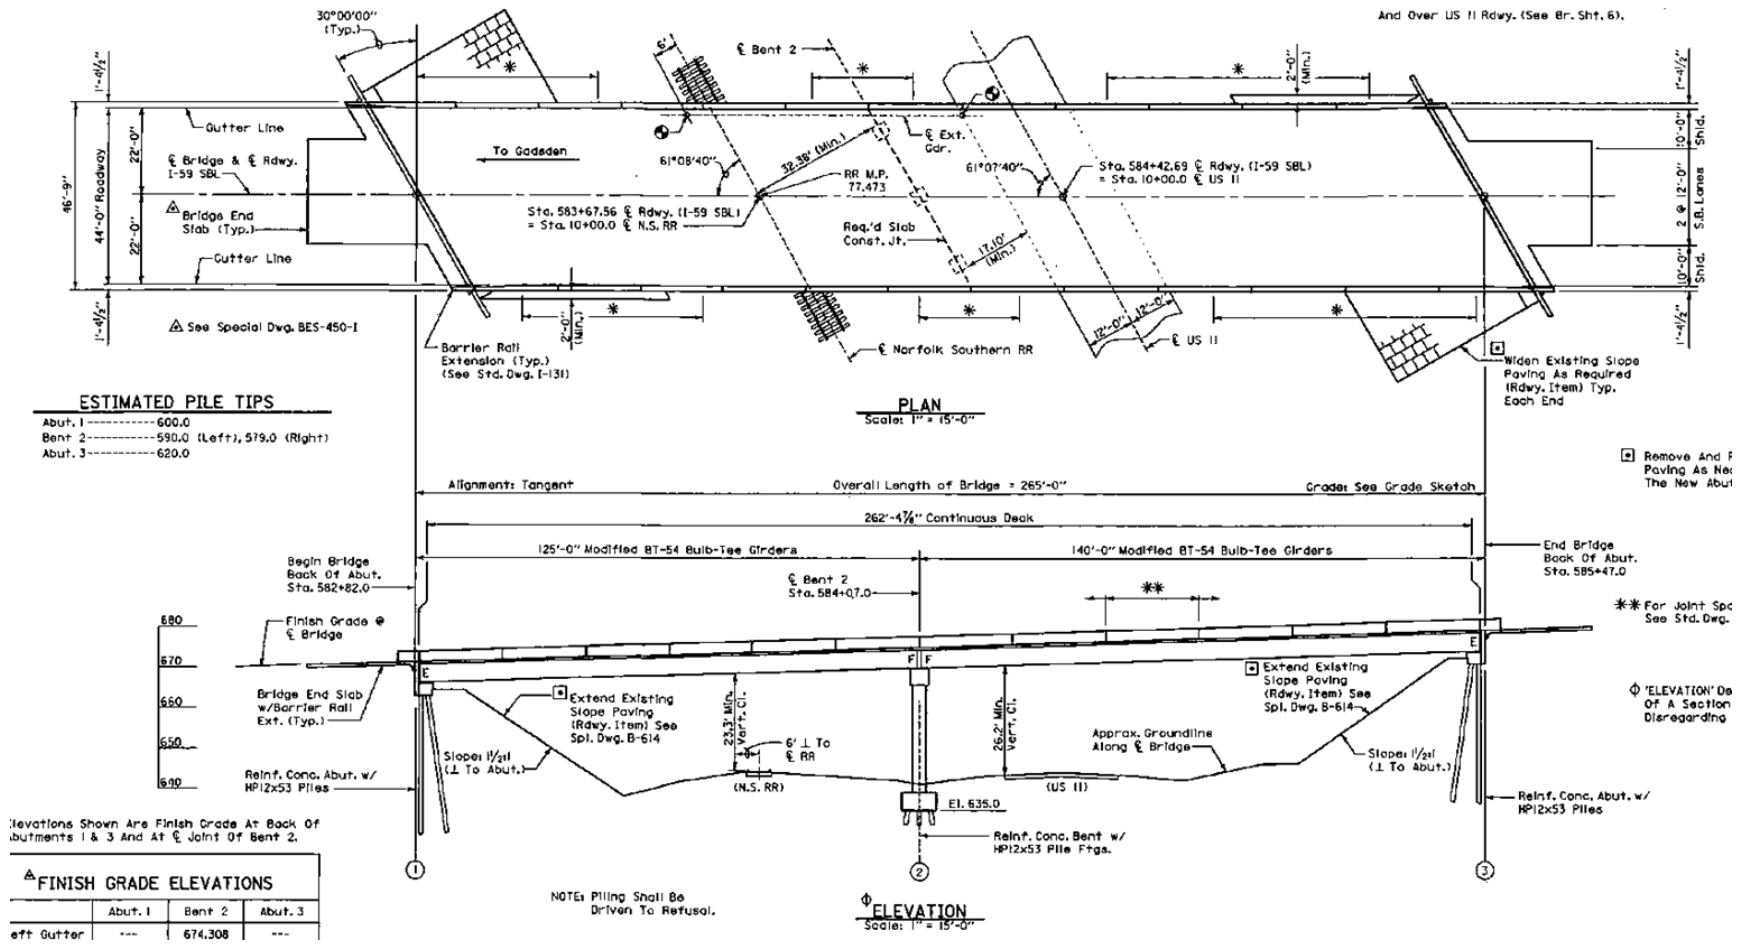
Etowah County bridge plan and elevation view (ALDOT 2011)
